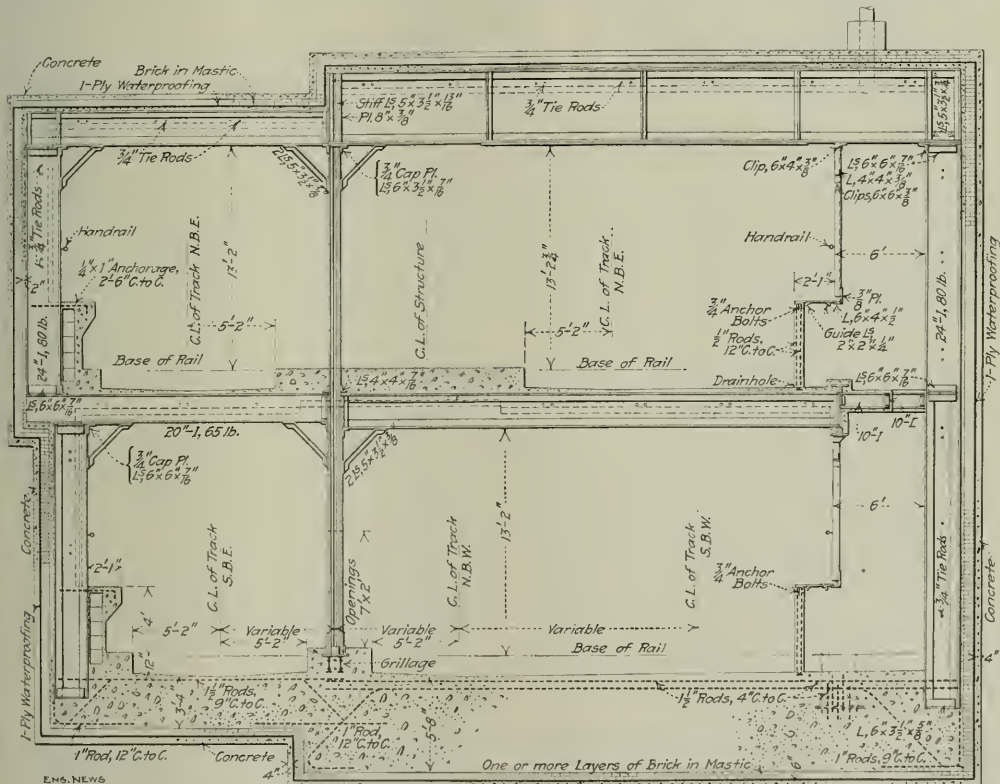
LEXINGTON AVE. SUBWAY AT 129TH ST. DOUBLE-DECK STEEL-FRAME CONSTRUCTION WITH HEAVY REINFORCED-CONCRETE FLOOR
